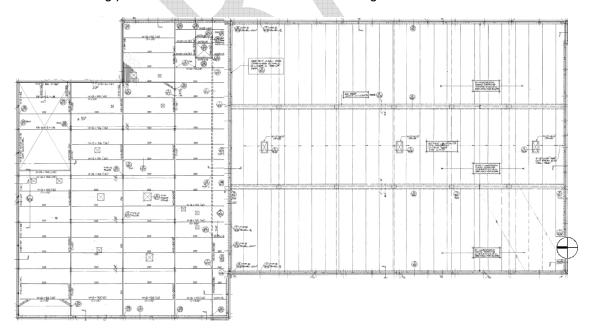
Roof Framing Plan, 1985 Construction
